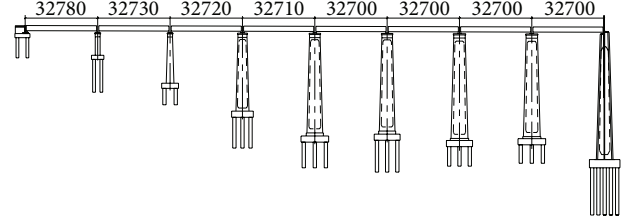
General elevation of a simple beam bridge (units: millimeters).
